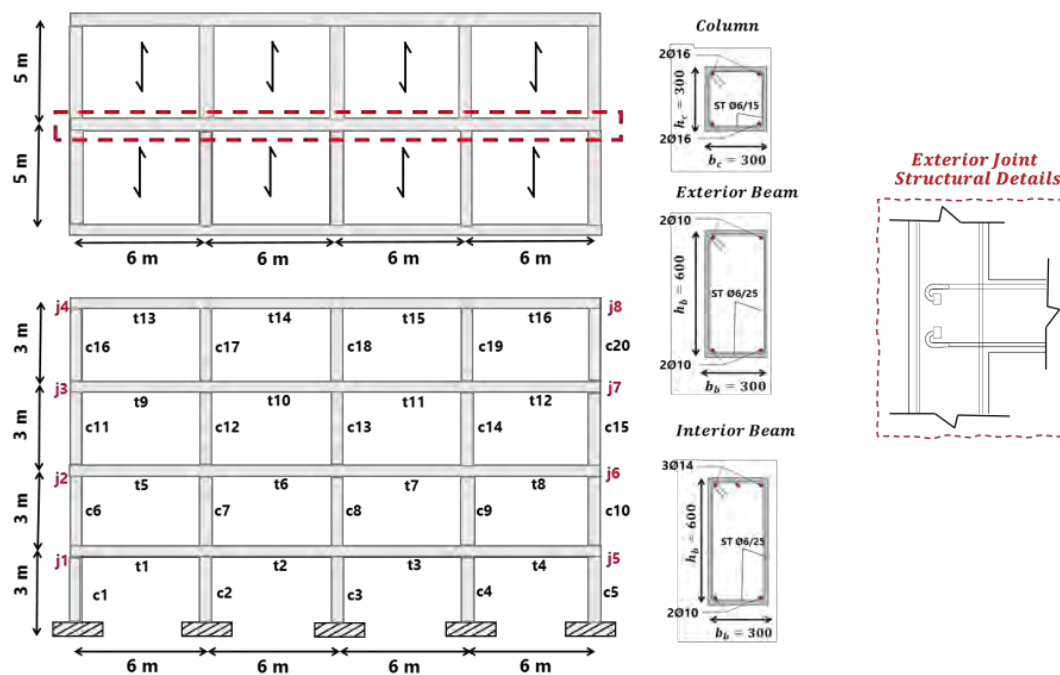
(Left) Plan view, rectangular shape, bear frame front view, long side. (Middle) Element's cross-sections. (Right) Exterior joints structural details
